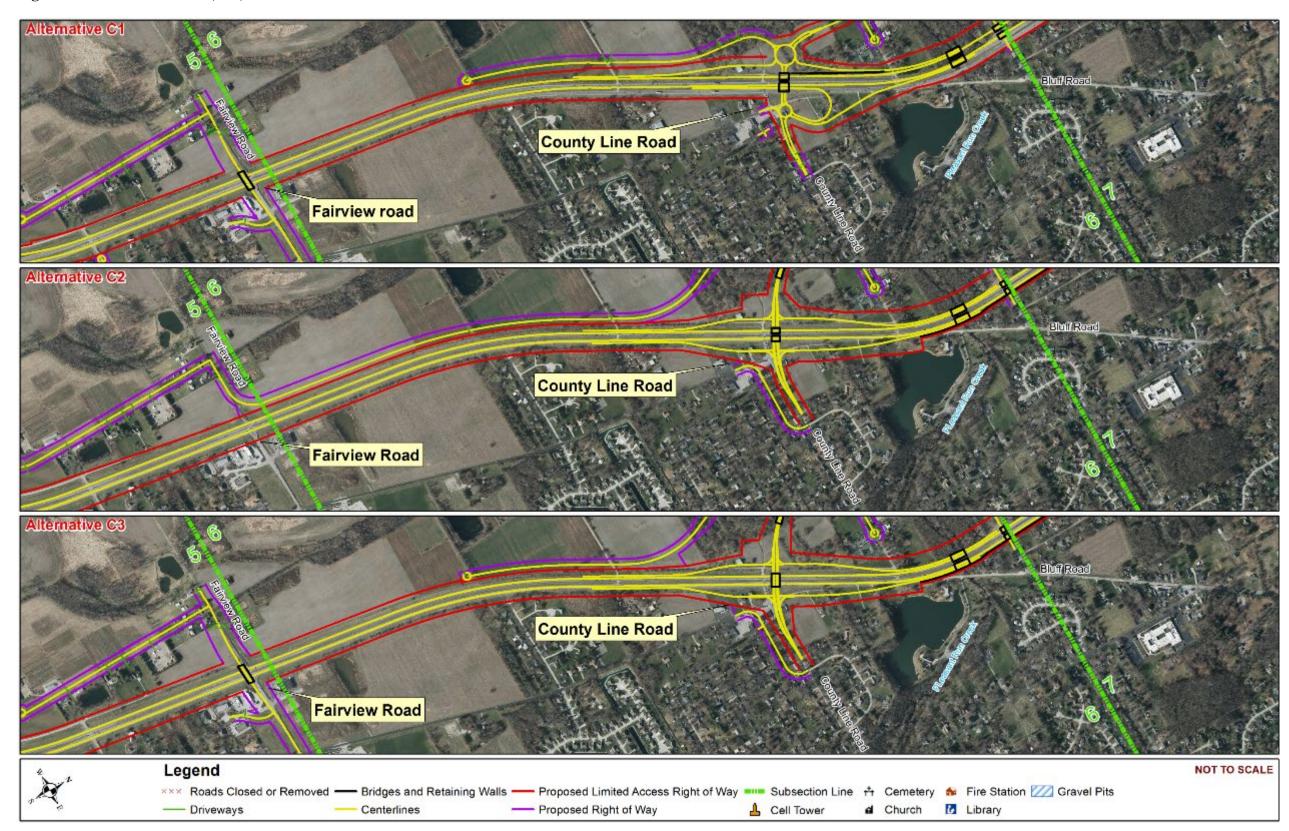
Alternatives C1, C2, and C3 from Fairview Road to Wicker Road
